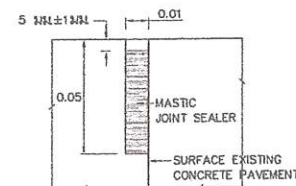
DETAIL OF SAWED JOINT FOR TRANSVERSE JOINT
